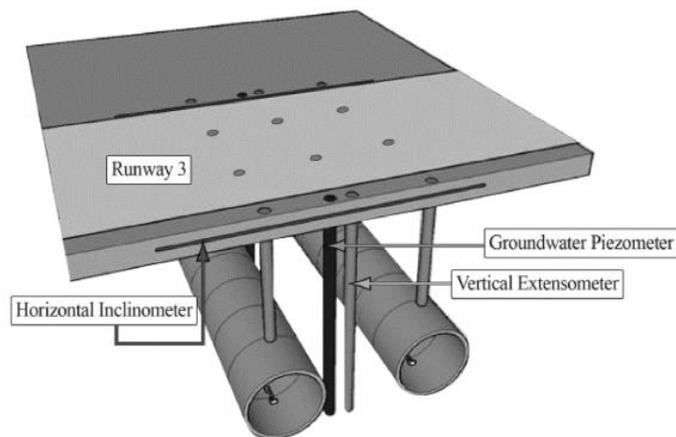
Geotechnical Monitoring and Tunneling beneath the Runway
